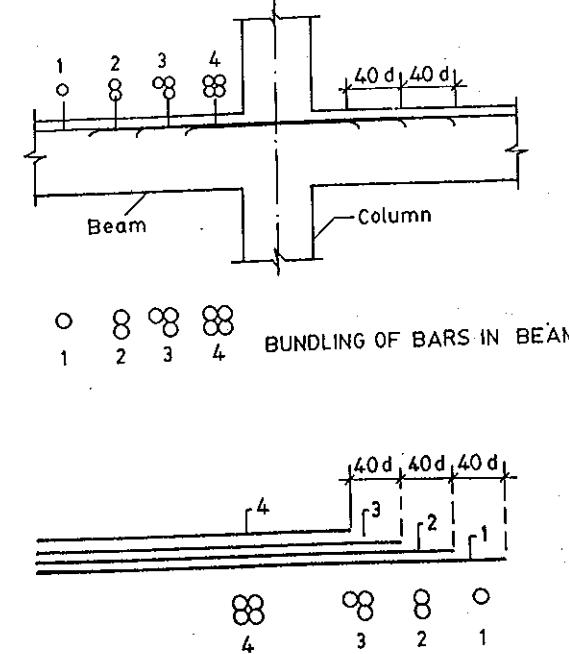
Bundling and Curtailment of Bars in Beams
